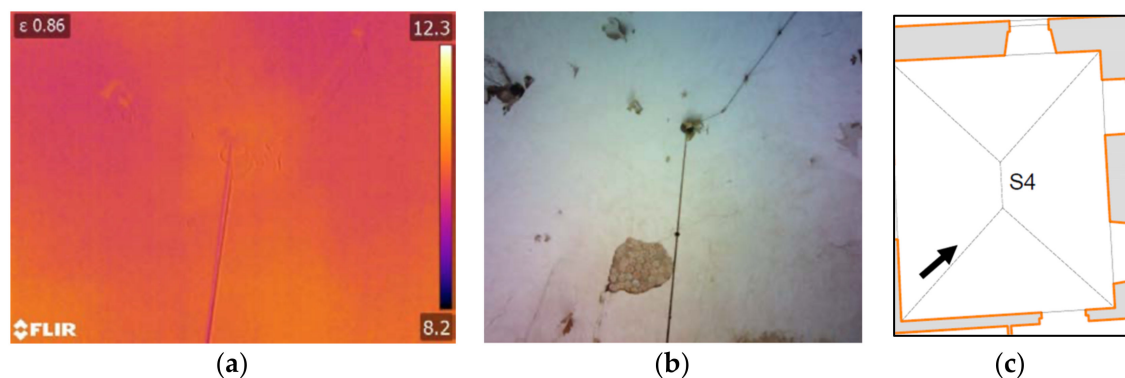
Room S4: (a) infrared image, (b) photography view and (c) plan view.
